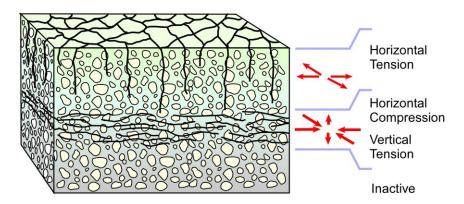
Idealized Sketch of Cracking Pattern in Concrete Mass Caused by Internal Expansion
